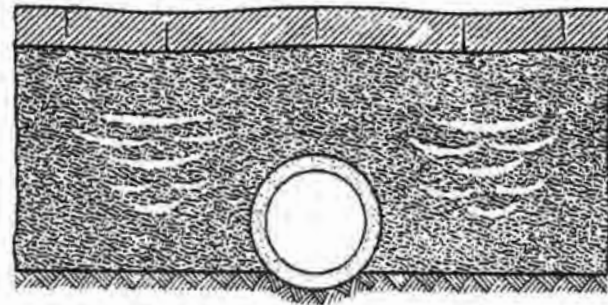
Pavement Failure Due to Inadequate Compaction or Low-Quality Fill Soil Adjacent to Rigid Pipe
